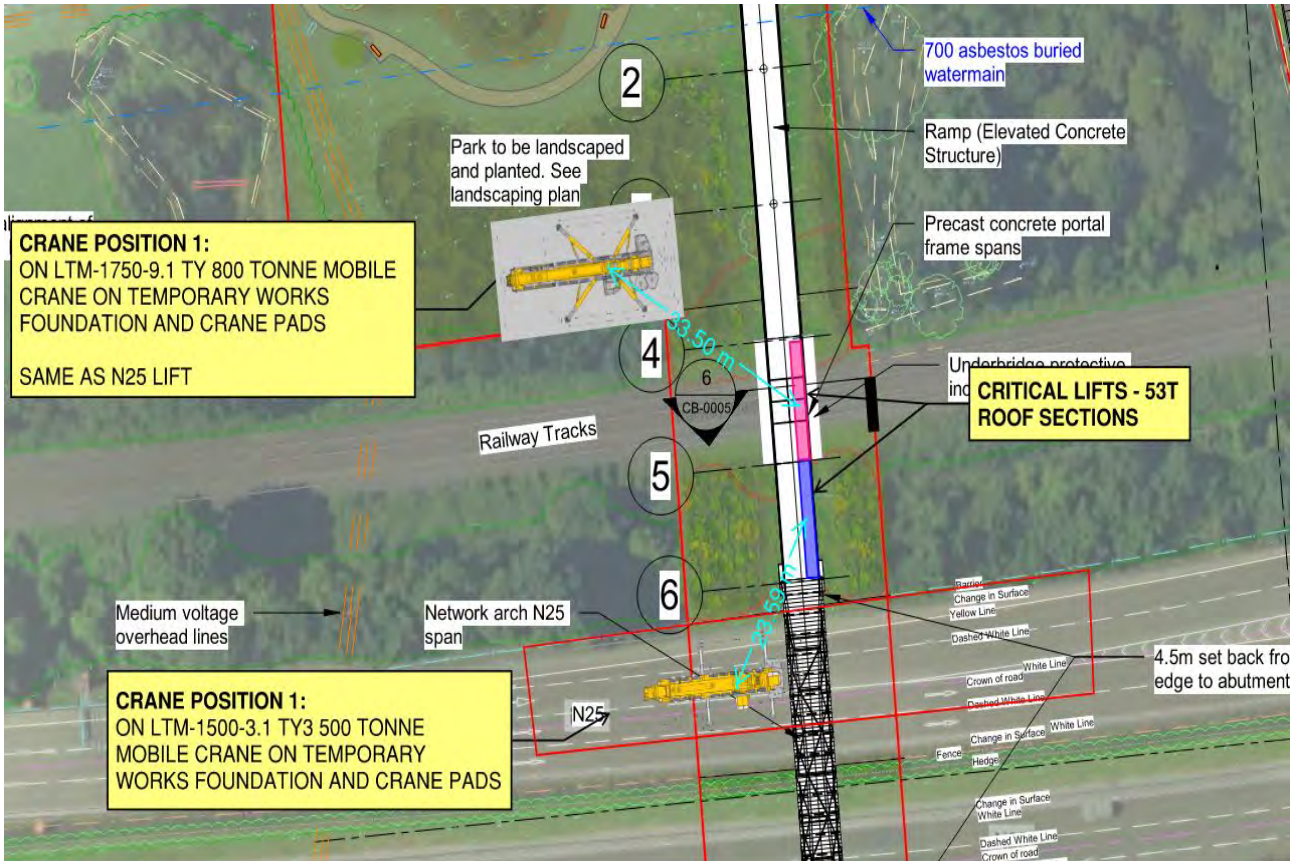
Proposed methodology for erection of southern elevated ramp precast concrete bridge beams
